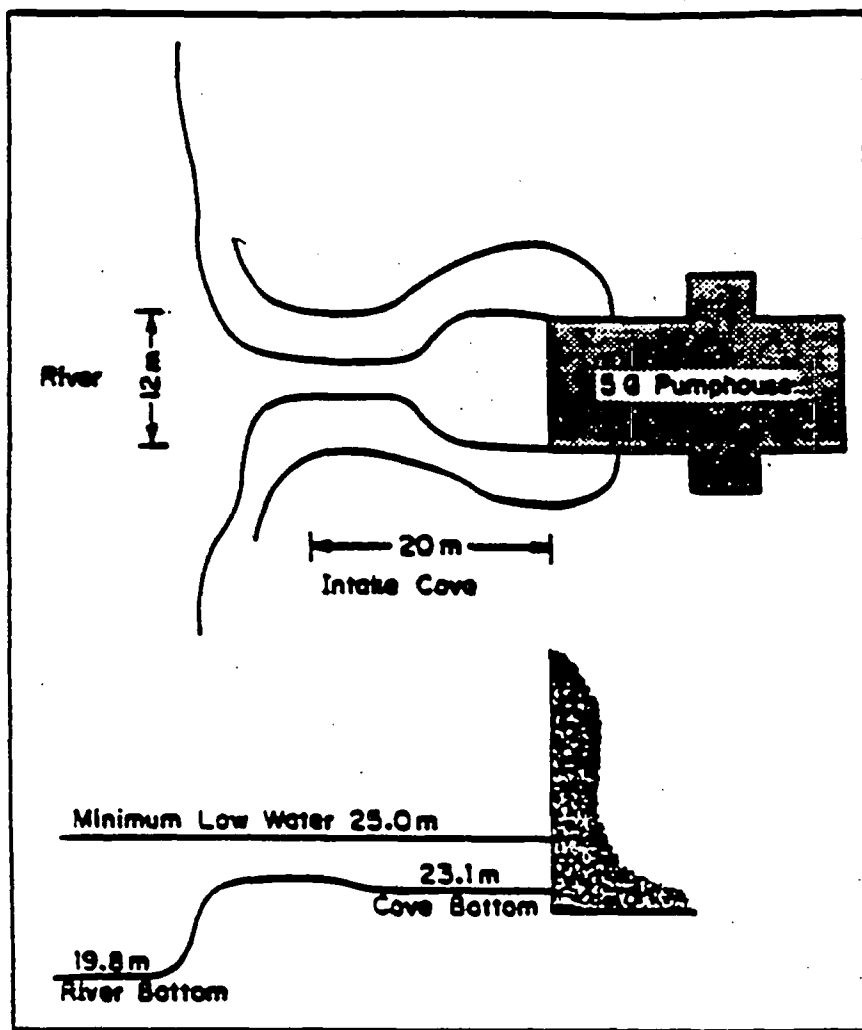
Plan View and Profile of 5G Intake Cove
